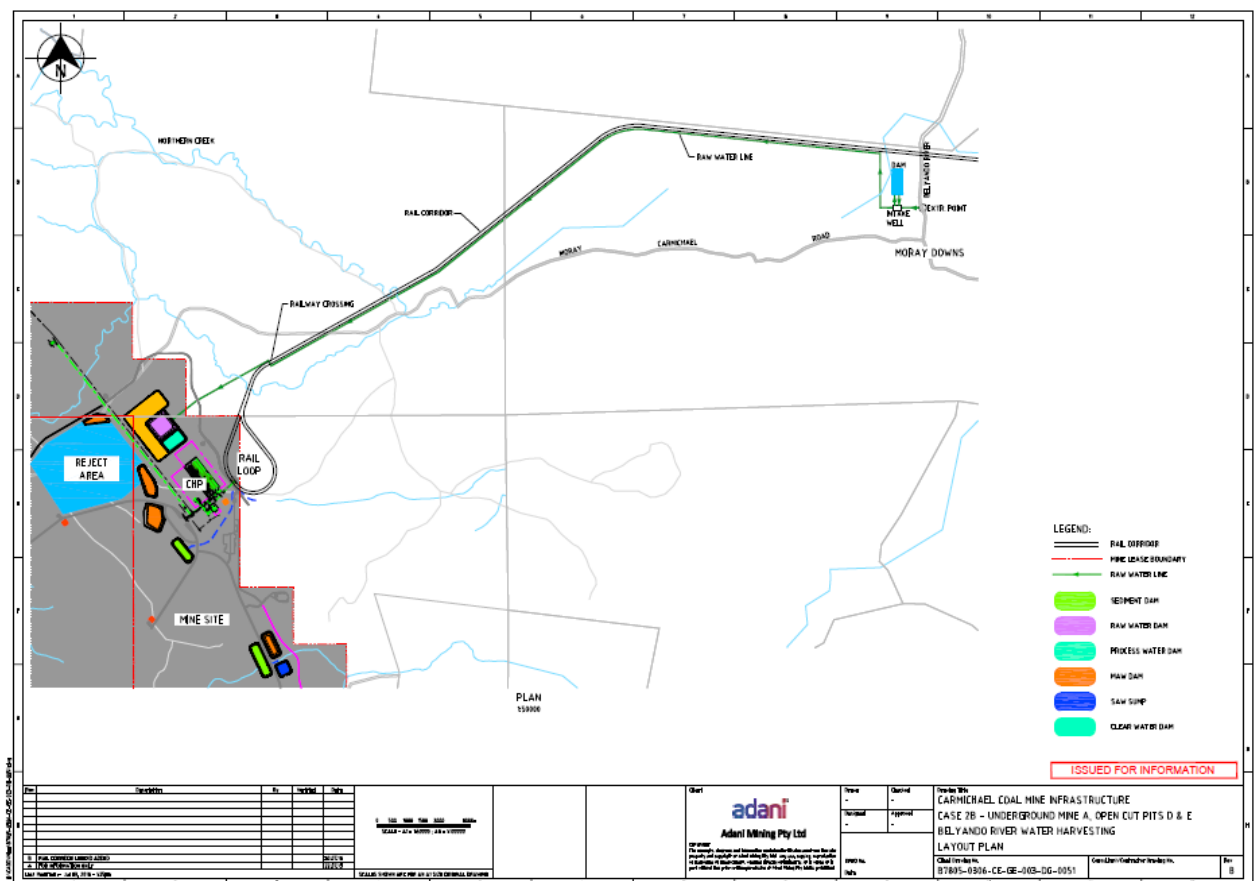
Layout Plan of Belyando River Water Harvesting
